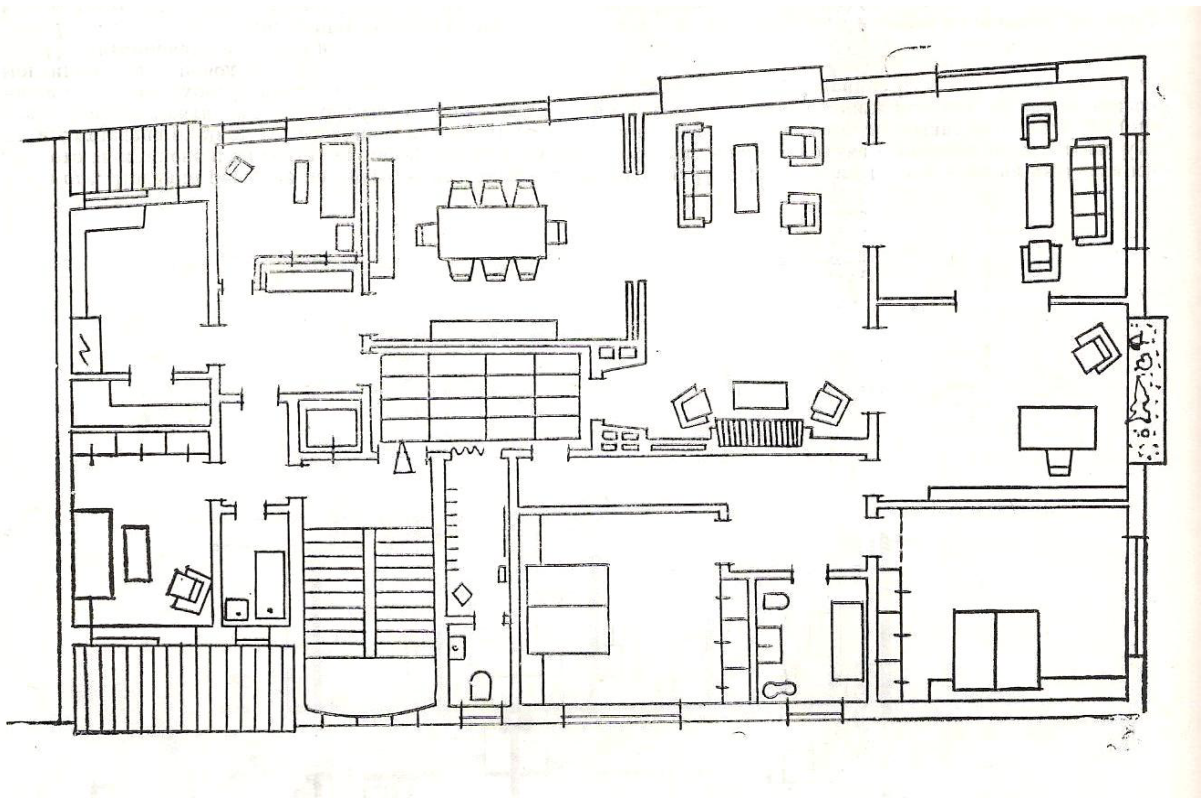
Floor plan of cooperative residential building at the corner of Vasil Levski Blvd and Slavyanska St.
